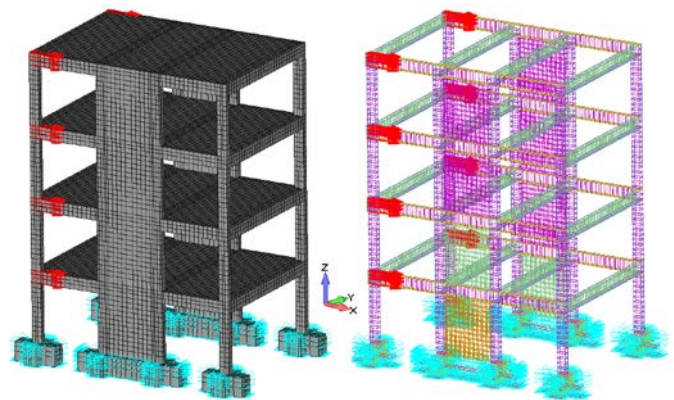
Full Hexa FE mesh. (Left) Discretization of the concrete domain and (Right) Embedded rebar elements.
